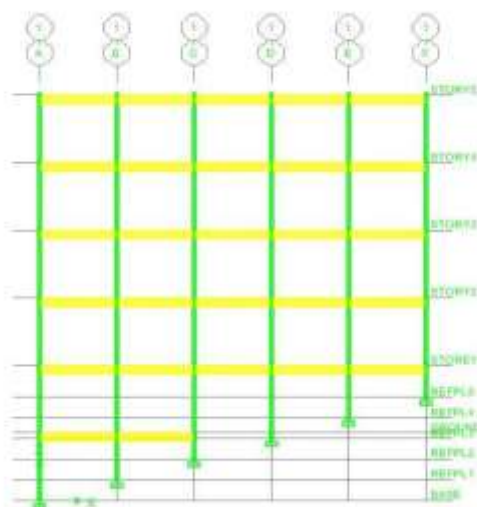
Elevation of step back building for five storey model (300 slope)
